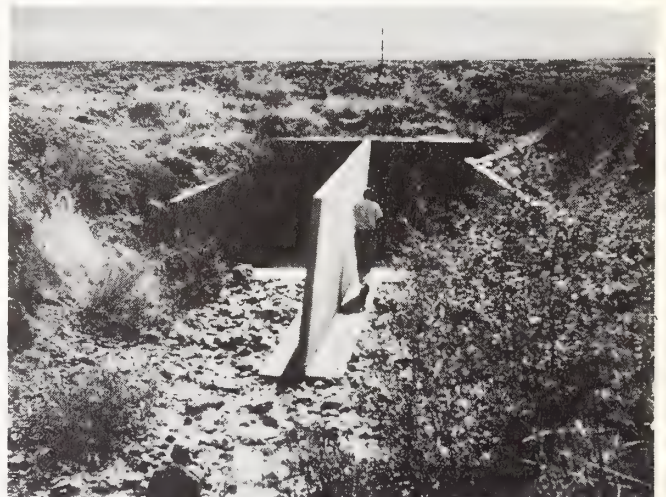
Concrete debris fin with rounded vertical leading edge as extension of culvert center wall.
